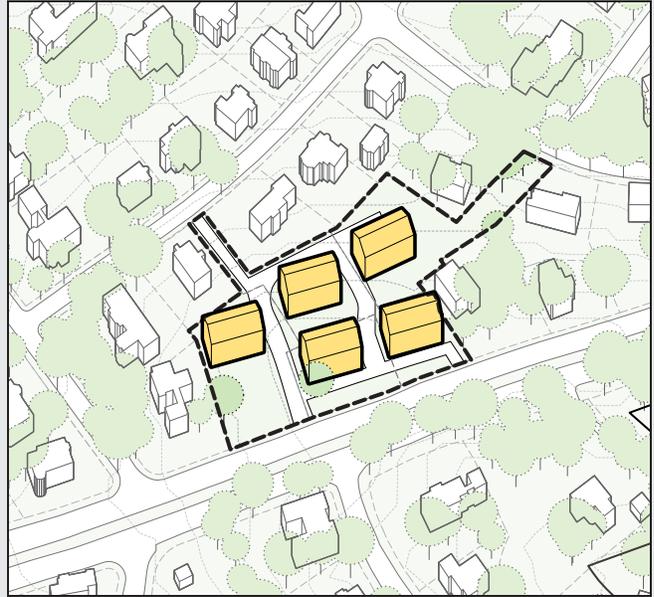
B: Edinburgh Property (not in MPS) Example of Build-out to Zoning Capacity
